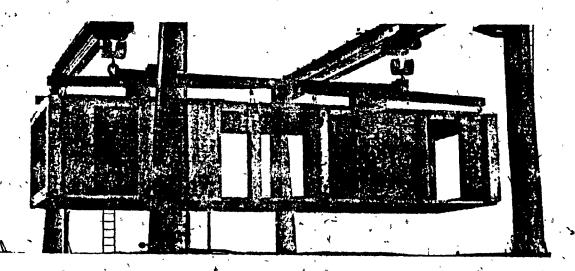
Bridge-Crane used to carry Box-Module (Ref. 33)
